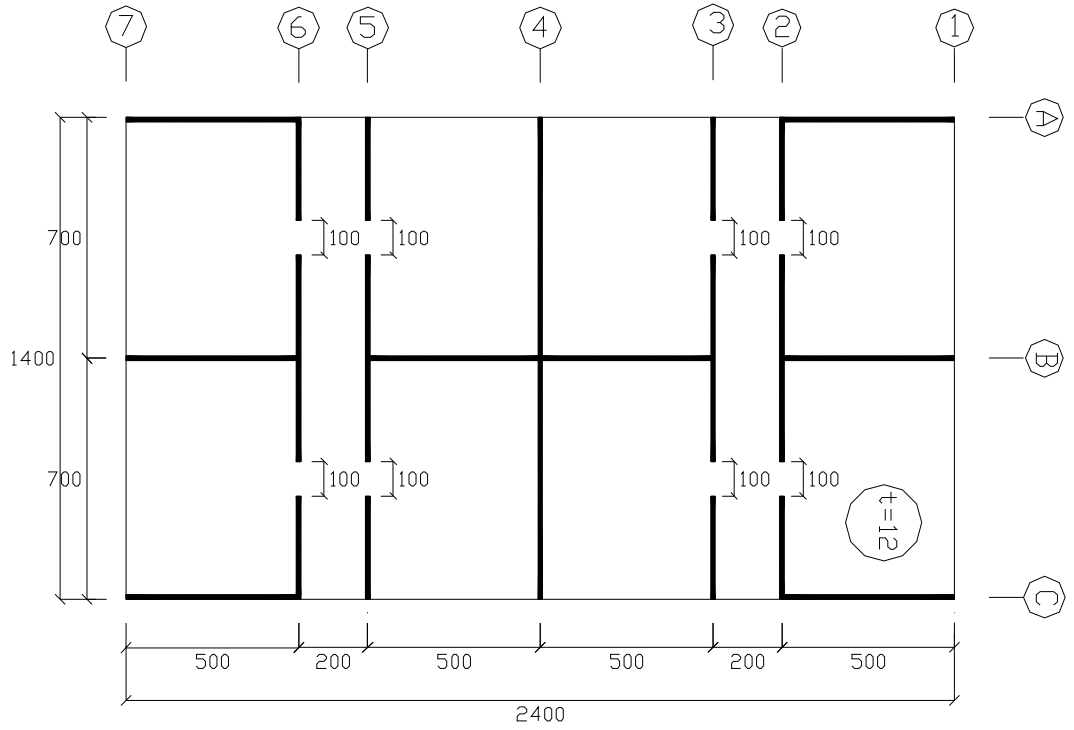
Typical plan view – Plan No. 17 (units in cm)
